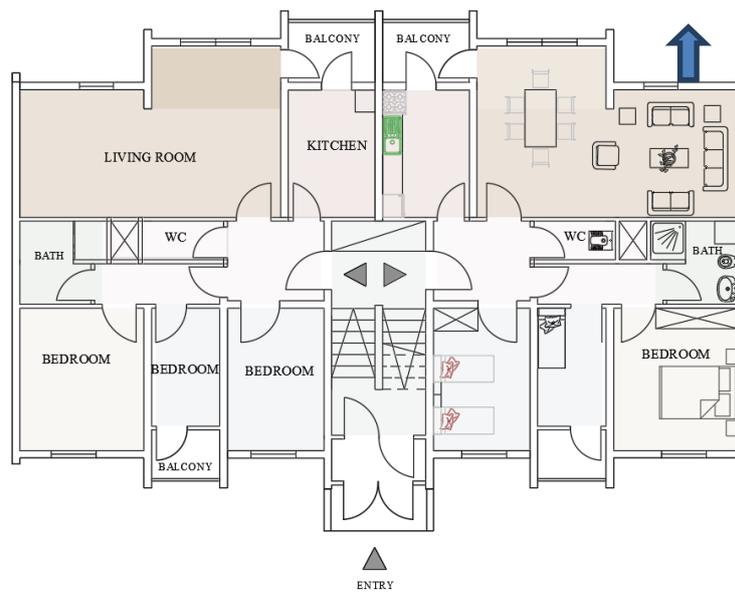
1st Stage Mass Housing Ground and Normal Floor plan of 100 m²
